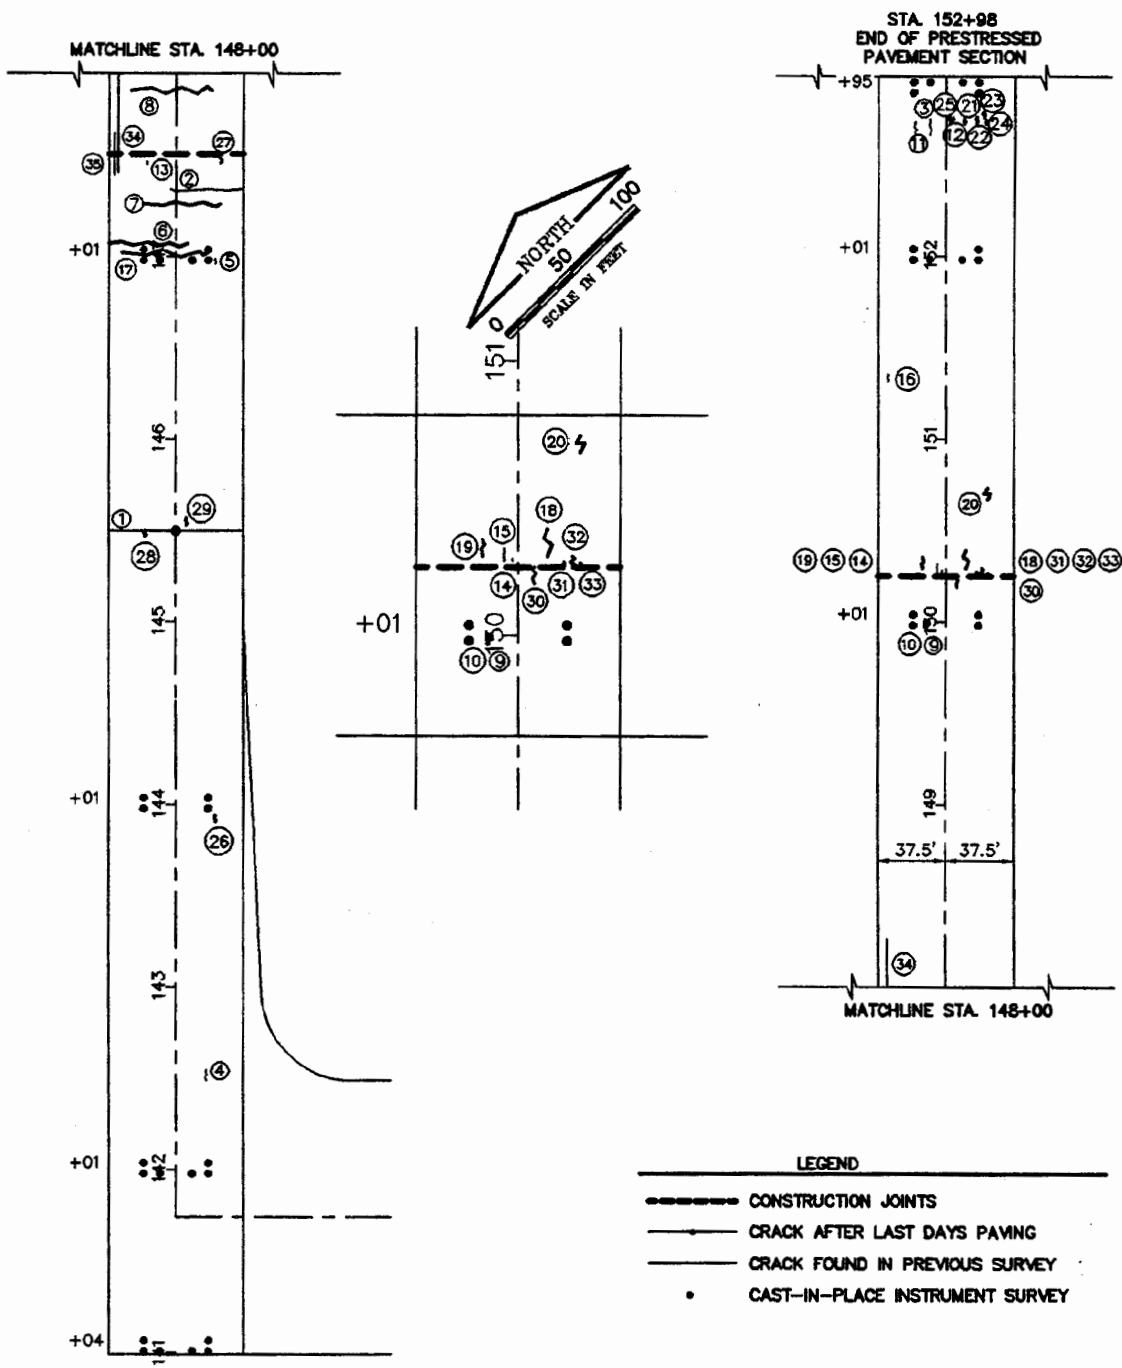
CRACKS IN PRESTRESSED CONCRETE PAVEMENT, SPRING 1998
